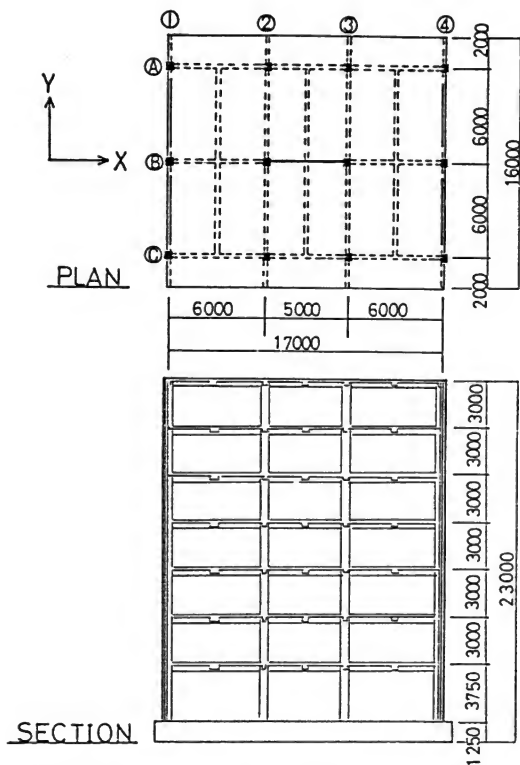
Plan, Elevation, and Dimension of the Specimen
